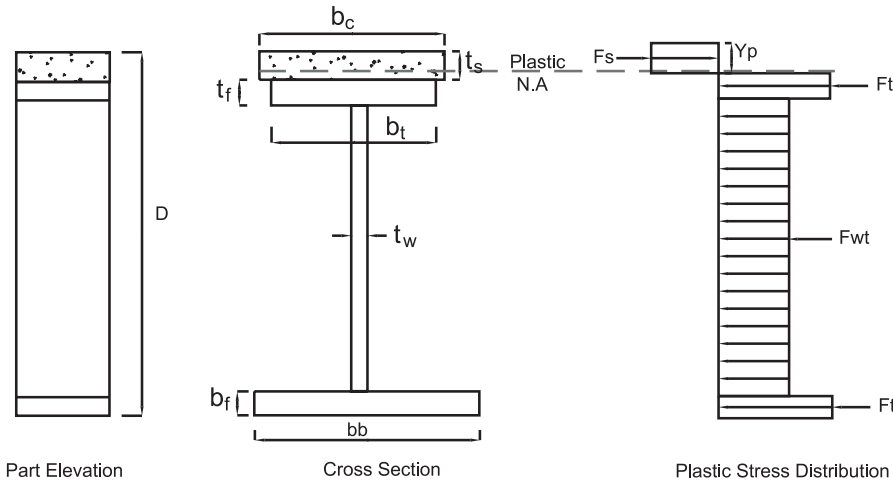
Plastic forces acting on composite section when plastic N.A. is located in concrete slab.
